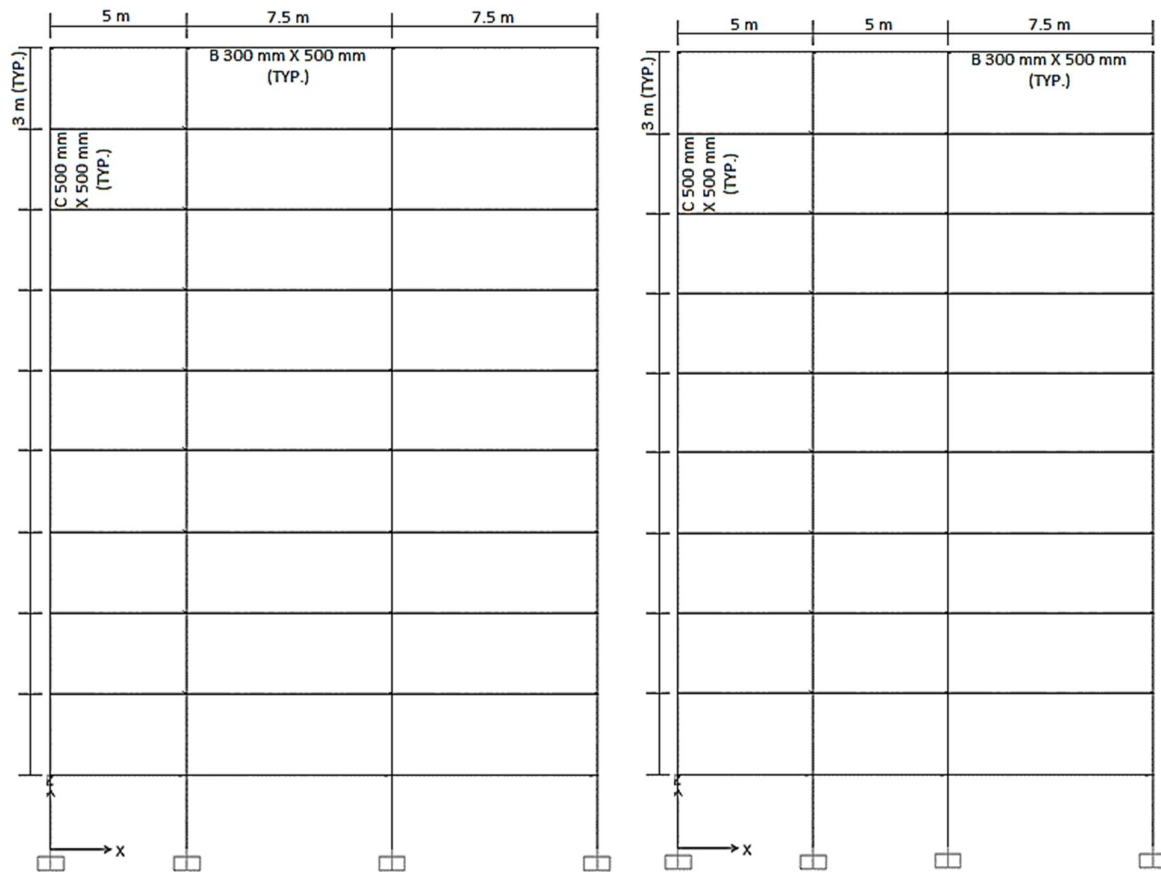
Elevation of the building without irregularity on plane ground as well as elevation of the building with horizontal irregularity on plane ground
